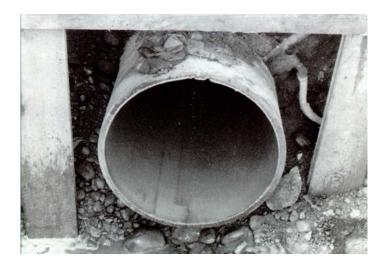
Photo. Completed Installation of Cement-mortar Spray-on Lining.⁽⁸⁾
